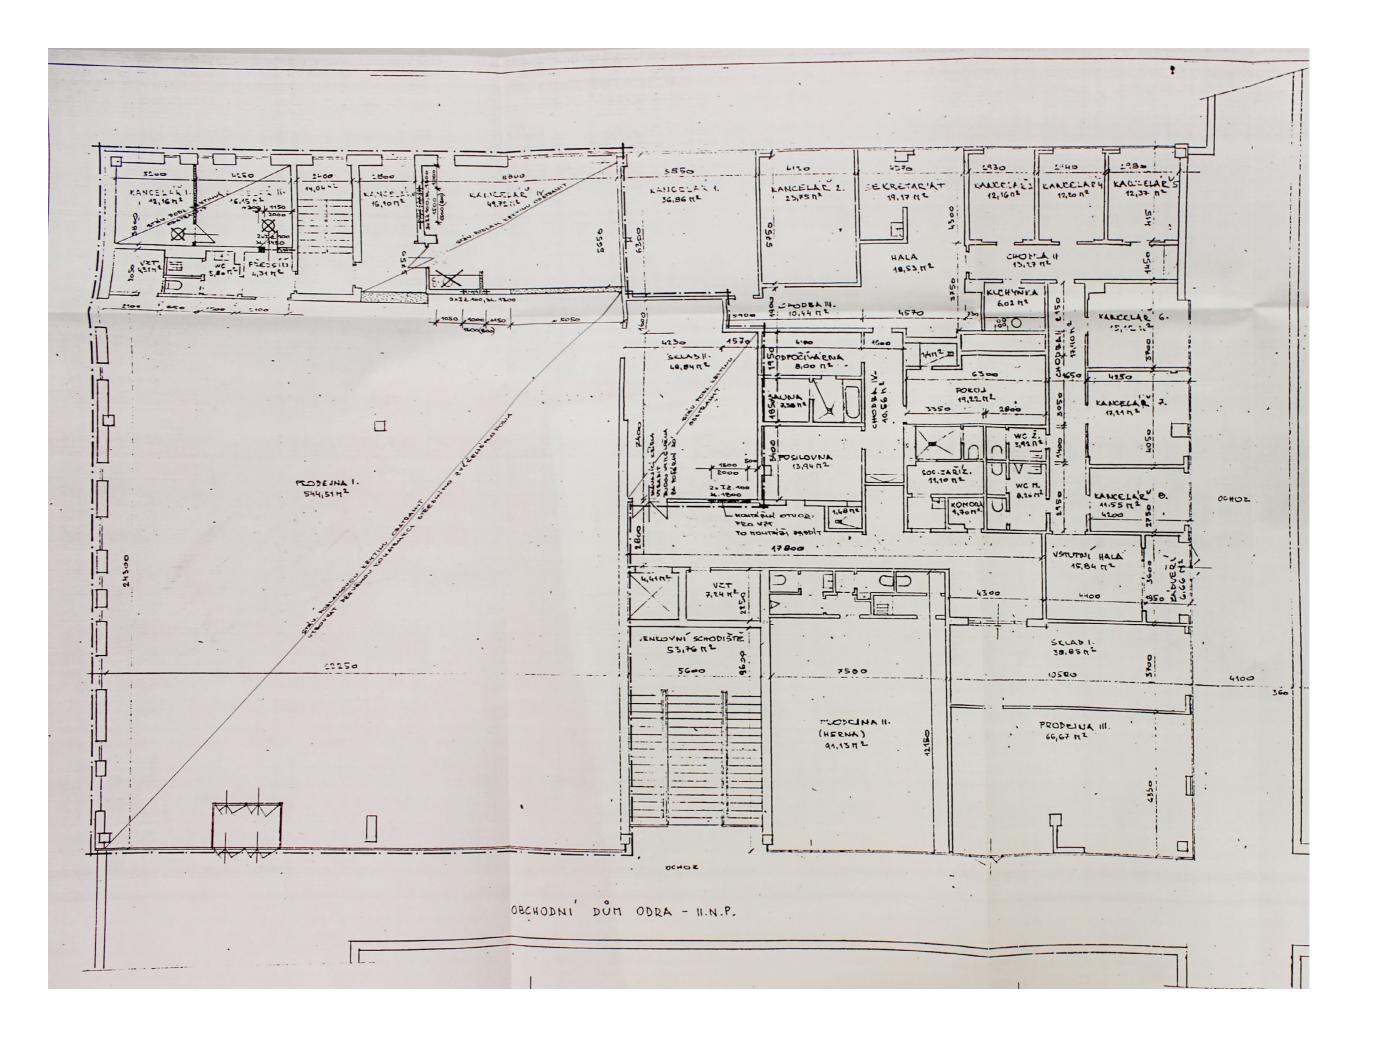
Plan of proposed adaptation for new supermarket Plus, first floor, 1994 © Building Authority of Prague 8 - Archives, 401 -5/5 objekt B
